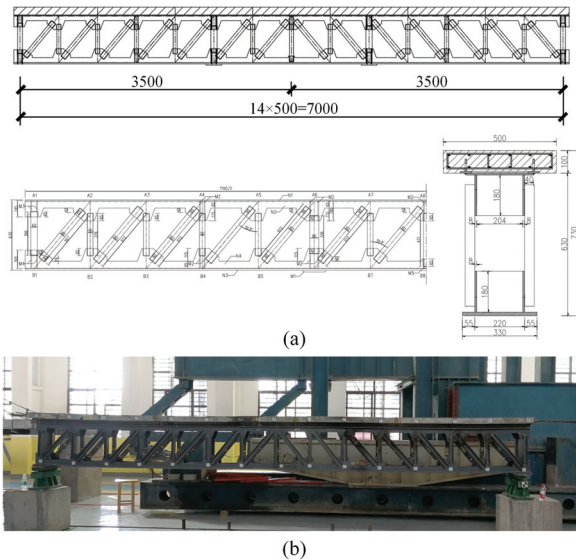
Steel truss–concrete composite beam for damage identification tests; (a) design dimensions of the test beam; (b) specimen entity.
